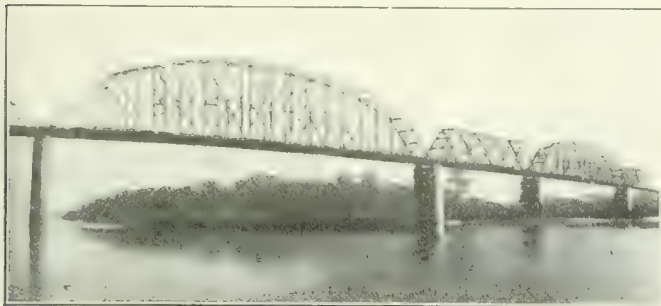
620-ft. Span Pin-connected Trusses. Typical of 1915 Construction.
